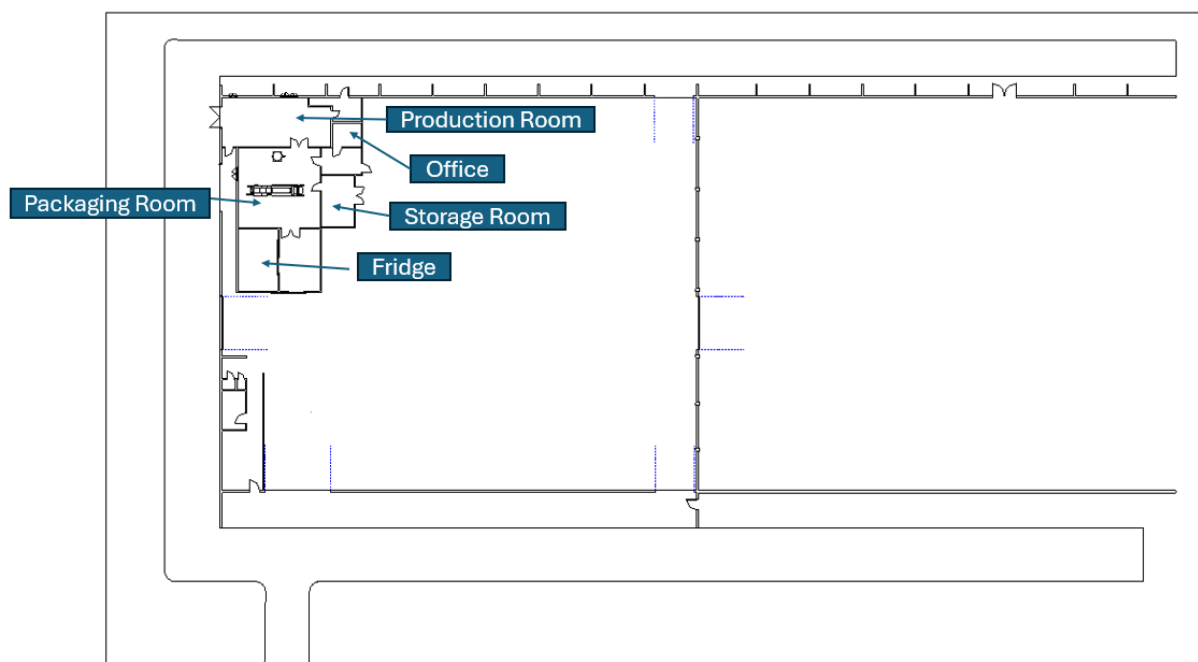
Computer-aided drawing of the ground floor plan of the barn.
